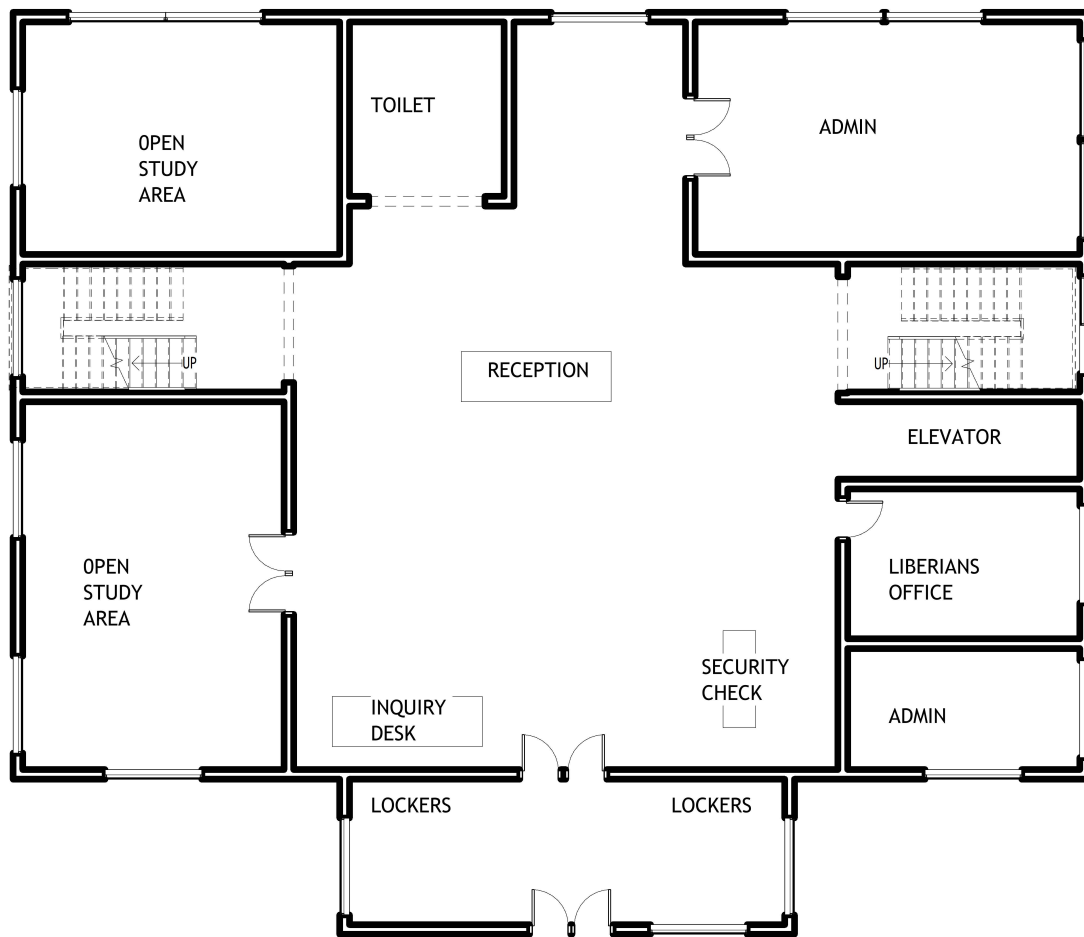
Ground floor plan of Delta State University (DELSU) Library (Source: Authors fieldwork)
